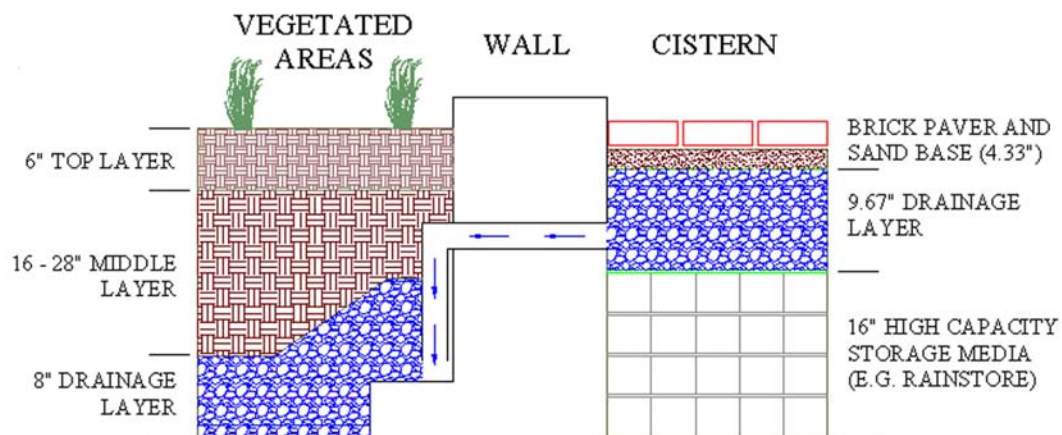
Cross-section detail showing storage of roof runoff beneath brick walkway using RainStore units.
